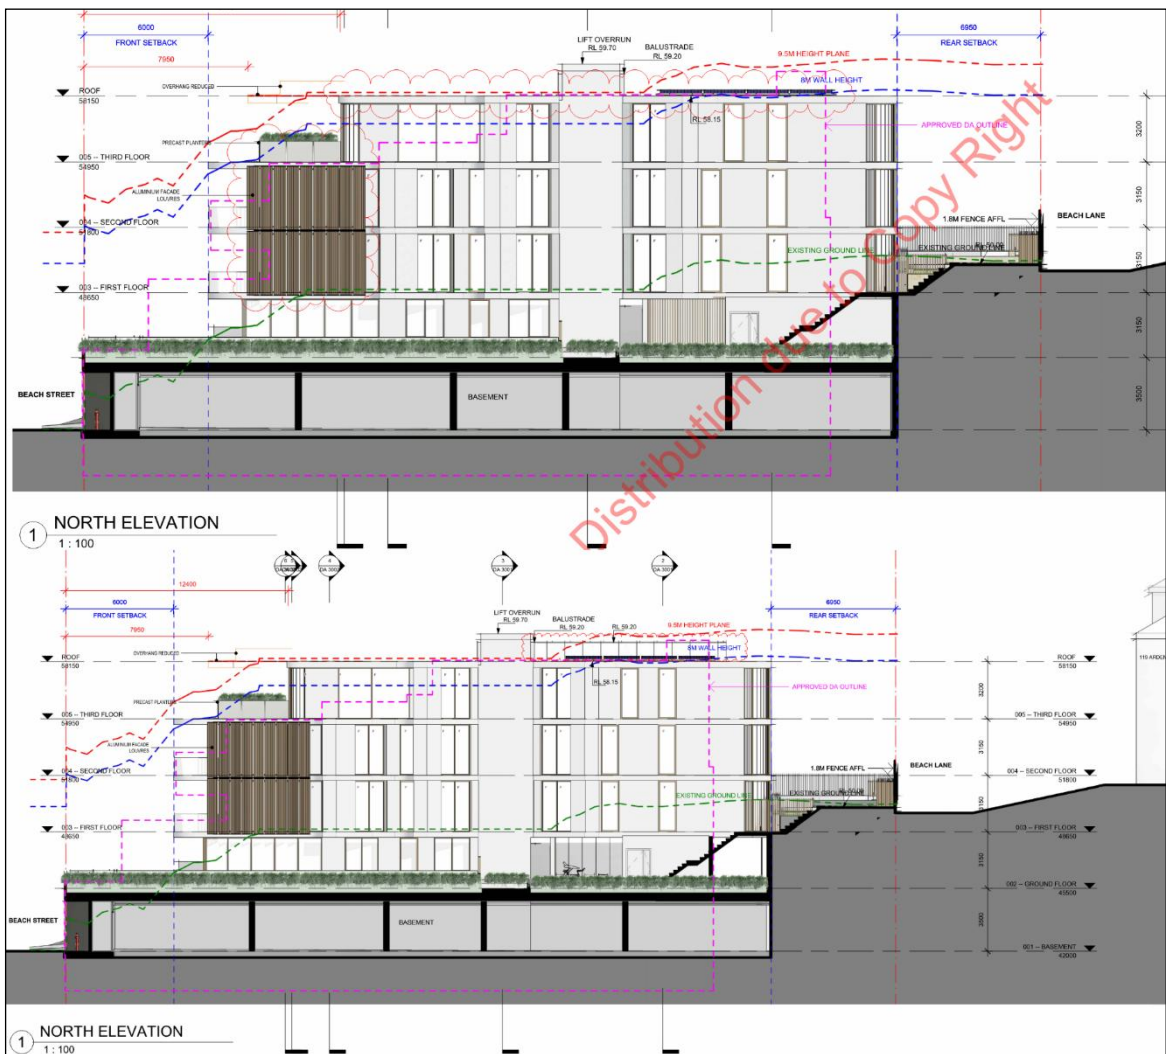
Existing (top) and proposed (bottom) northern elevation (source: Orosi)
